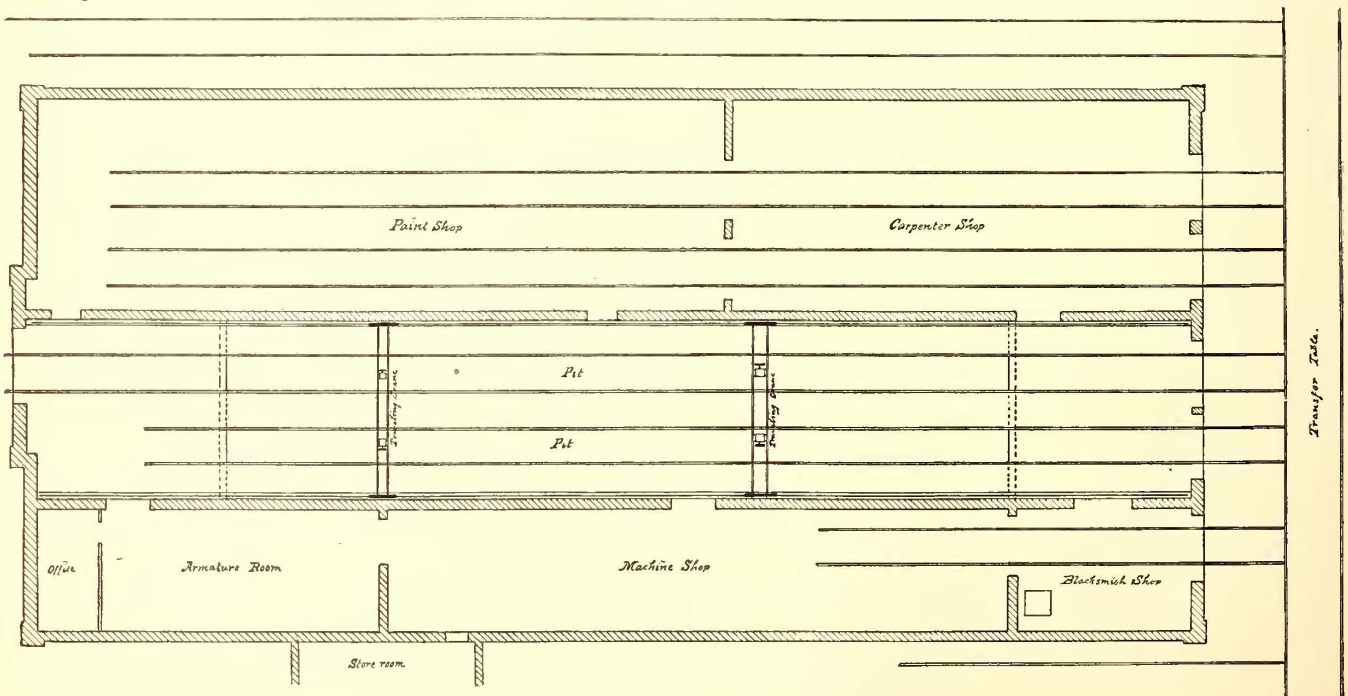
PLAN OF CAR HOUSE—ALBANY RAILWAY.
